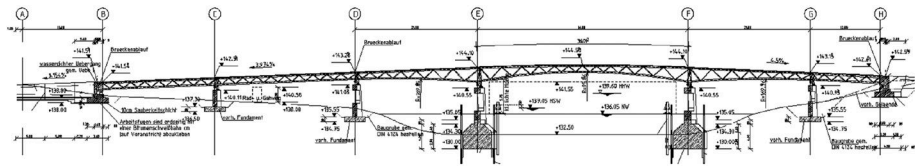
Longitudinal section through Gärtnerplatz Bridge
